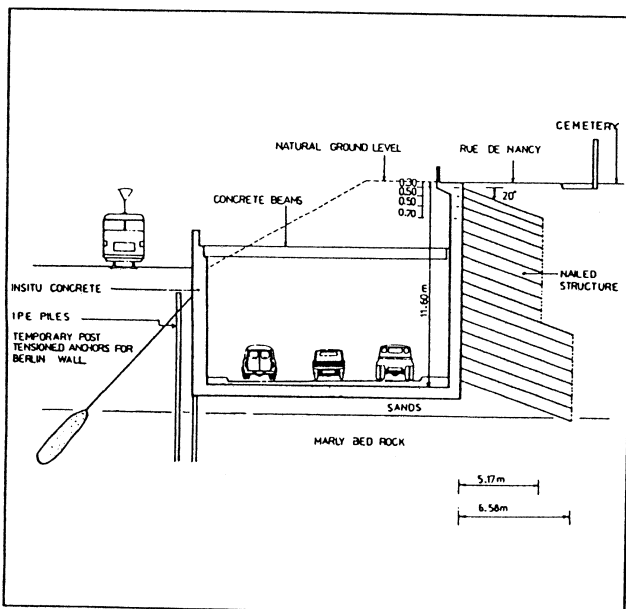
Cross-section of the Nogent-sur-Marne A86 excavation (After Goulesco and Medio, 1981)
